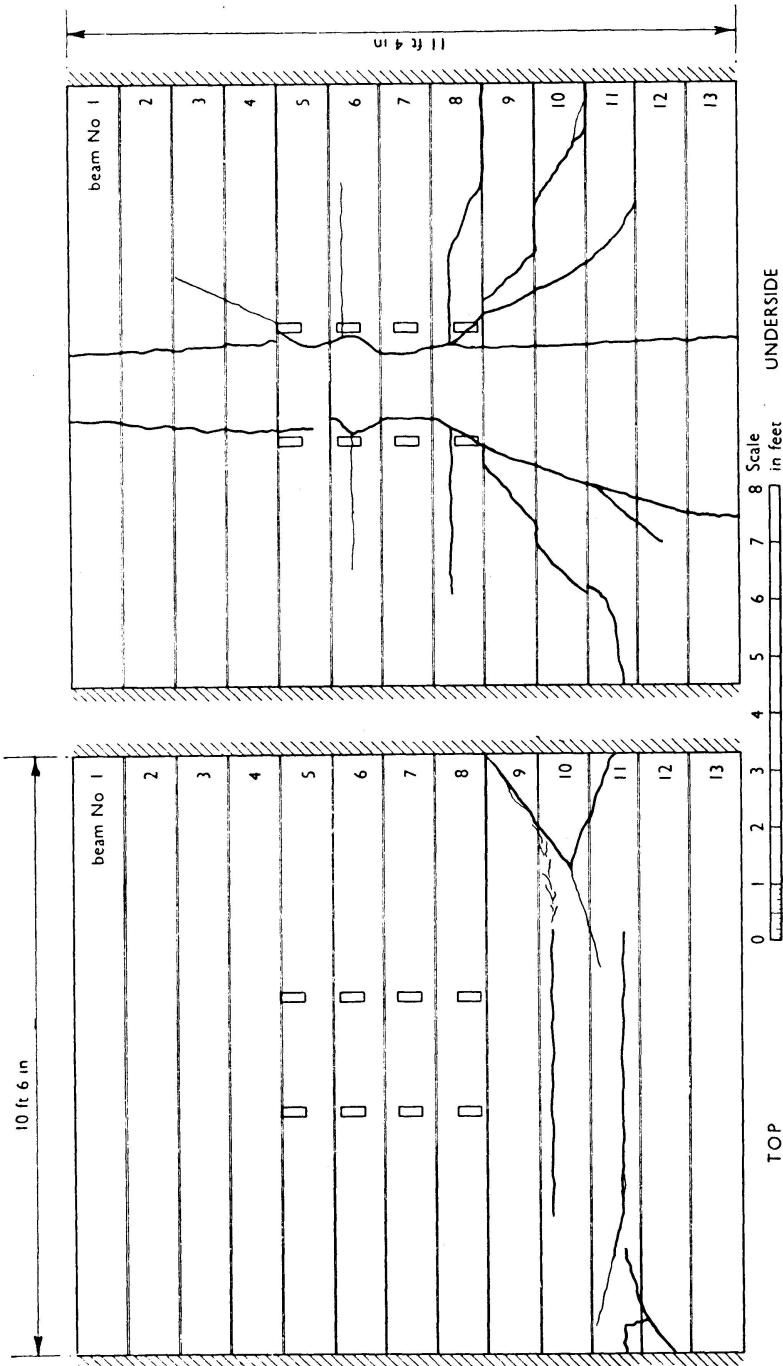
Composite Slab Bridges — Bridge No. 2 — Crack Patterns on Upper and Lower Surfaces of Bridge at Failure.
